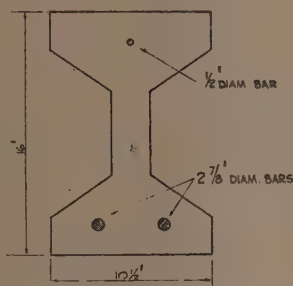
Section of roof beams in extension to the works of the Bristol Stone and Concrete Company
